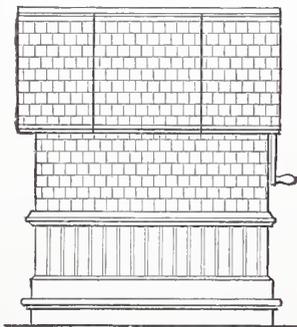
Side Elevation. Design for Well House.—Scale, 1/4 Inch to the Foot.
